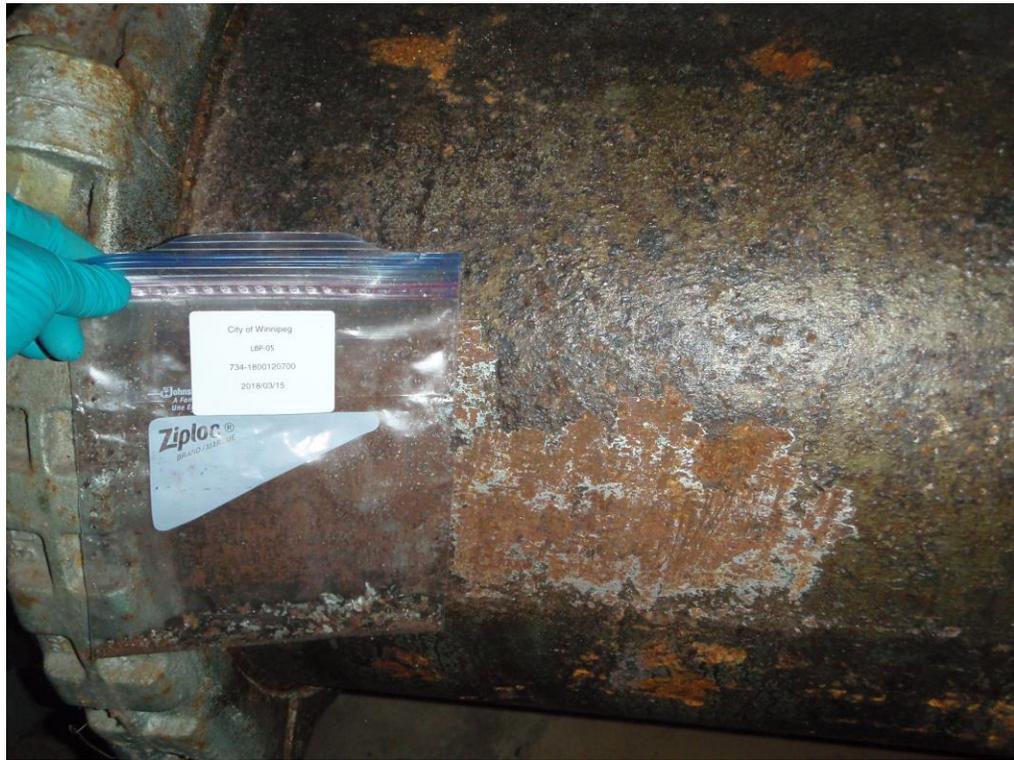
General view of paint chip sample location LBP-05 on the piping for pump 2 in the dry well. (March 15, 2018)
